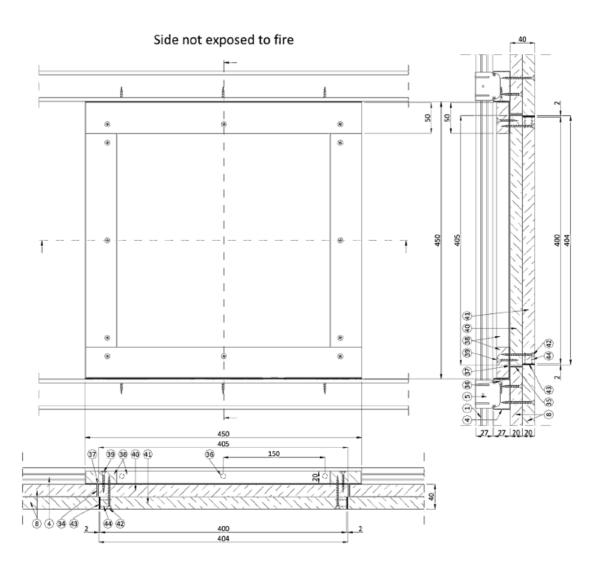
Schematic drawing of fitting "E" $\,$
